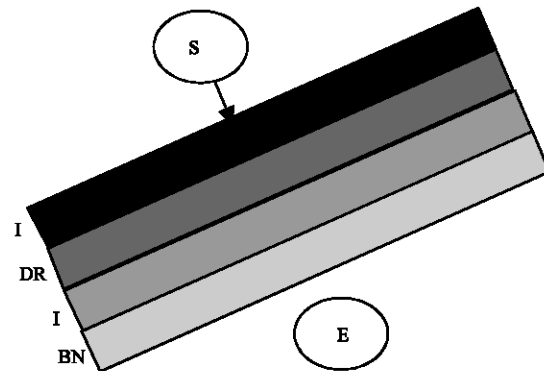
Sandwich structure, I: Impervious layer, DR: Draining layer, BN: Binder layer (connection), E: Fill, S: Seal coat
